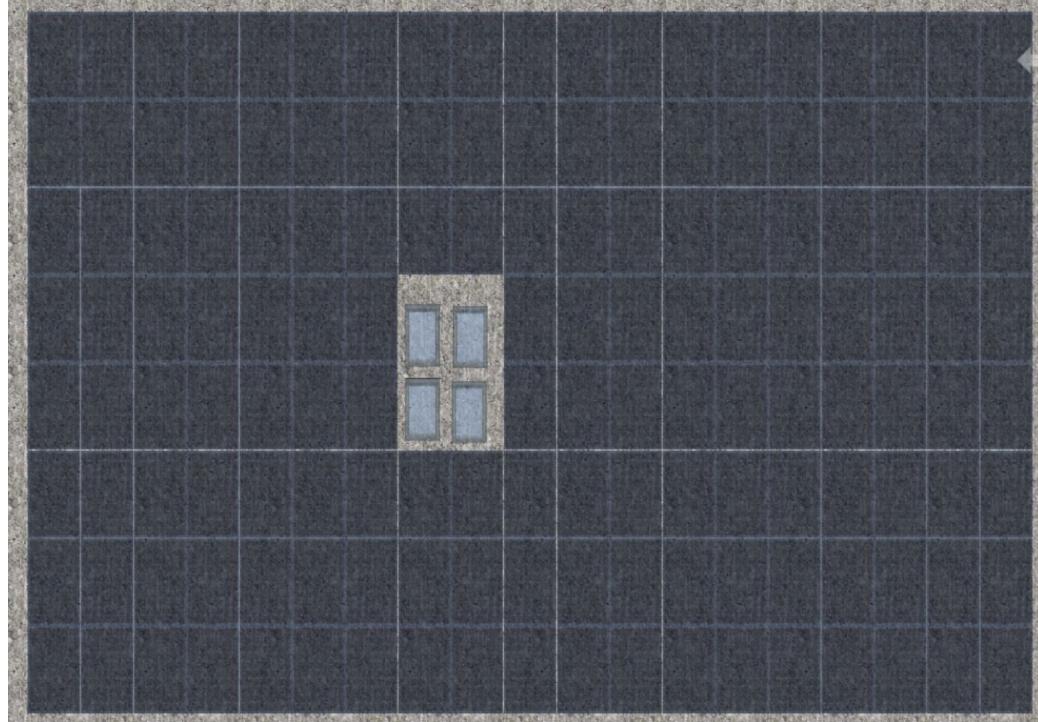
Proposed layout of the roof-mounted PV array
